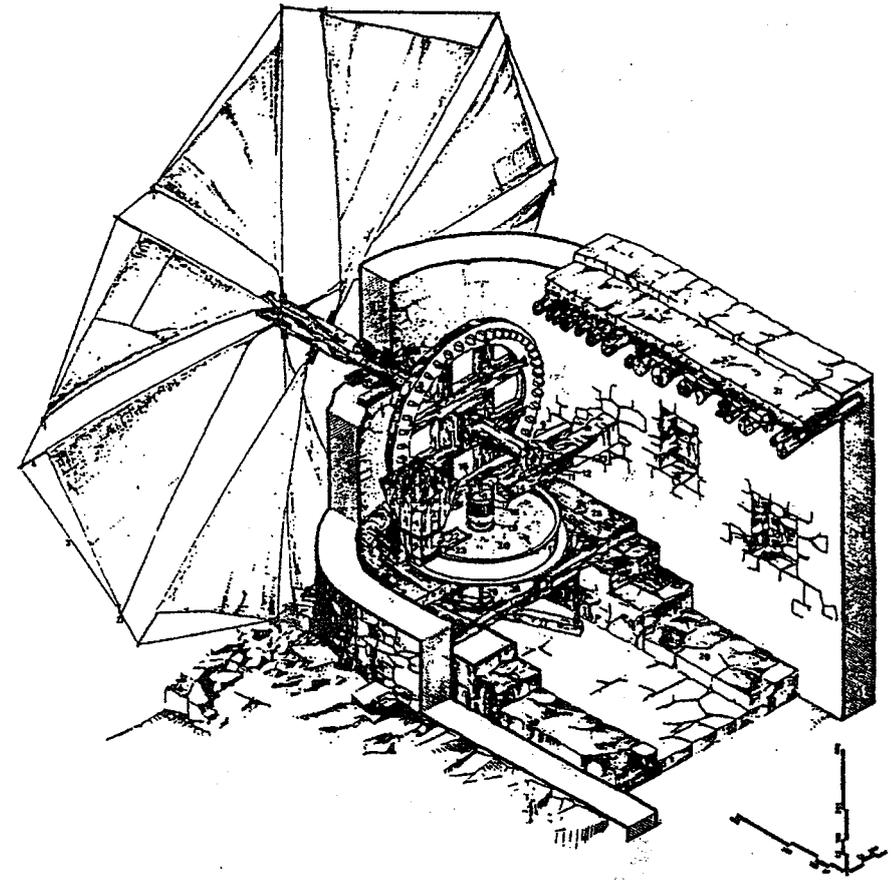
Cut-away view inside a fixed mill showing the machinery.
